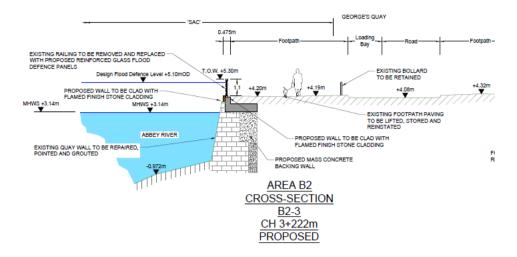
Section showing mass concrete backing to quay wall to support proposed flood defence.
